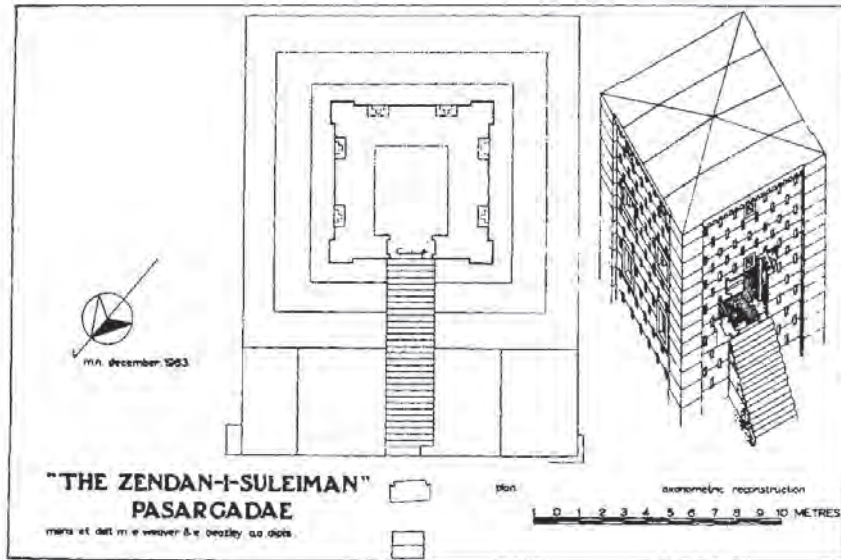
Plan of Zendan with axonometric reconstruction of roof and upper walls at right
